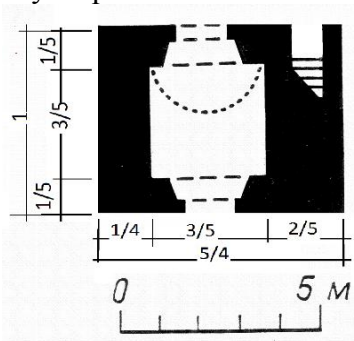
Plan of the gate tower with the bell tower. D. Makar's measurements, analysis of T. Nesterova proportions
